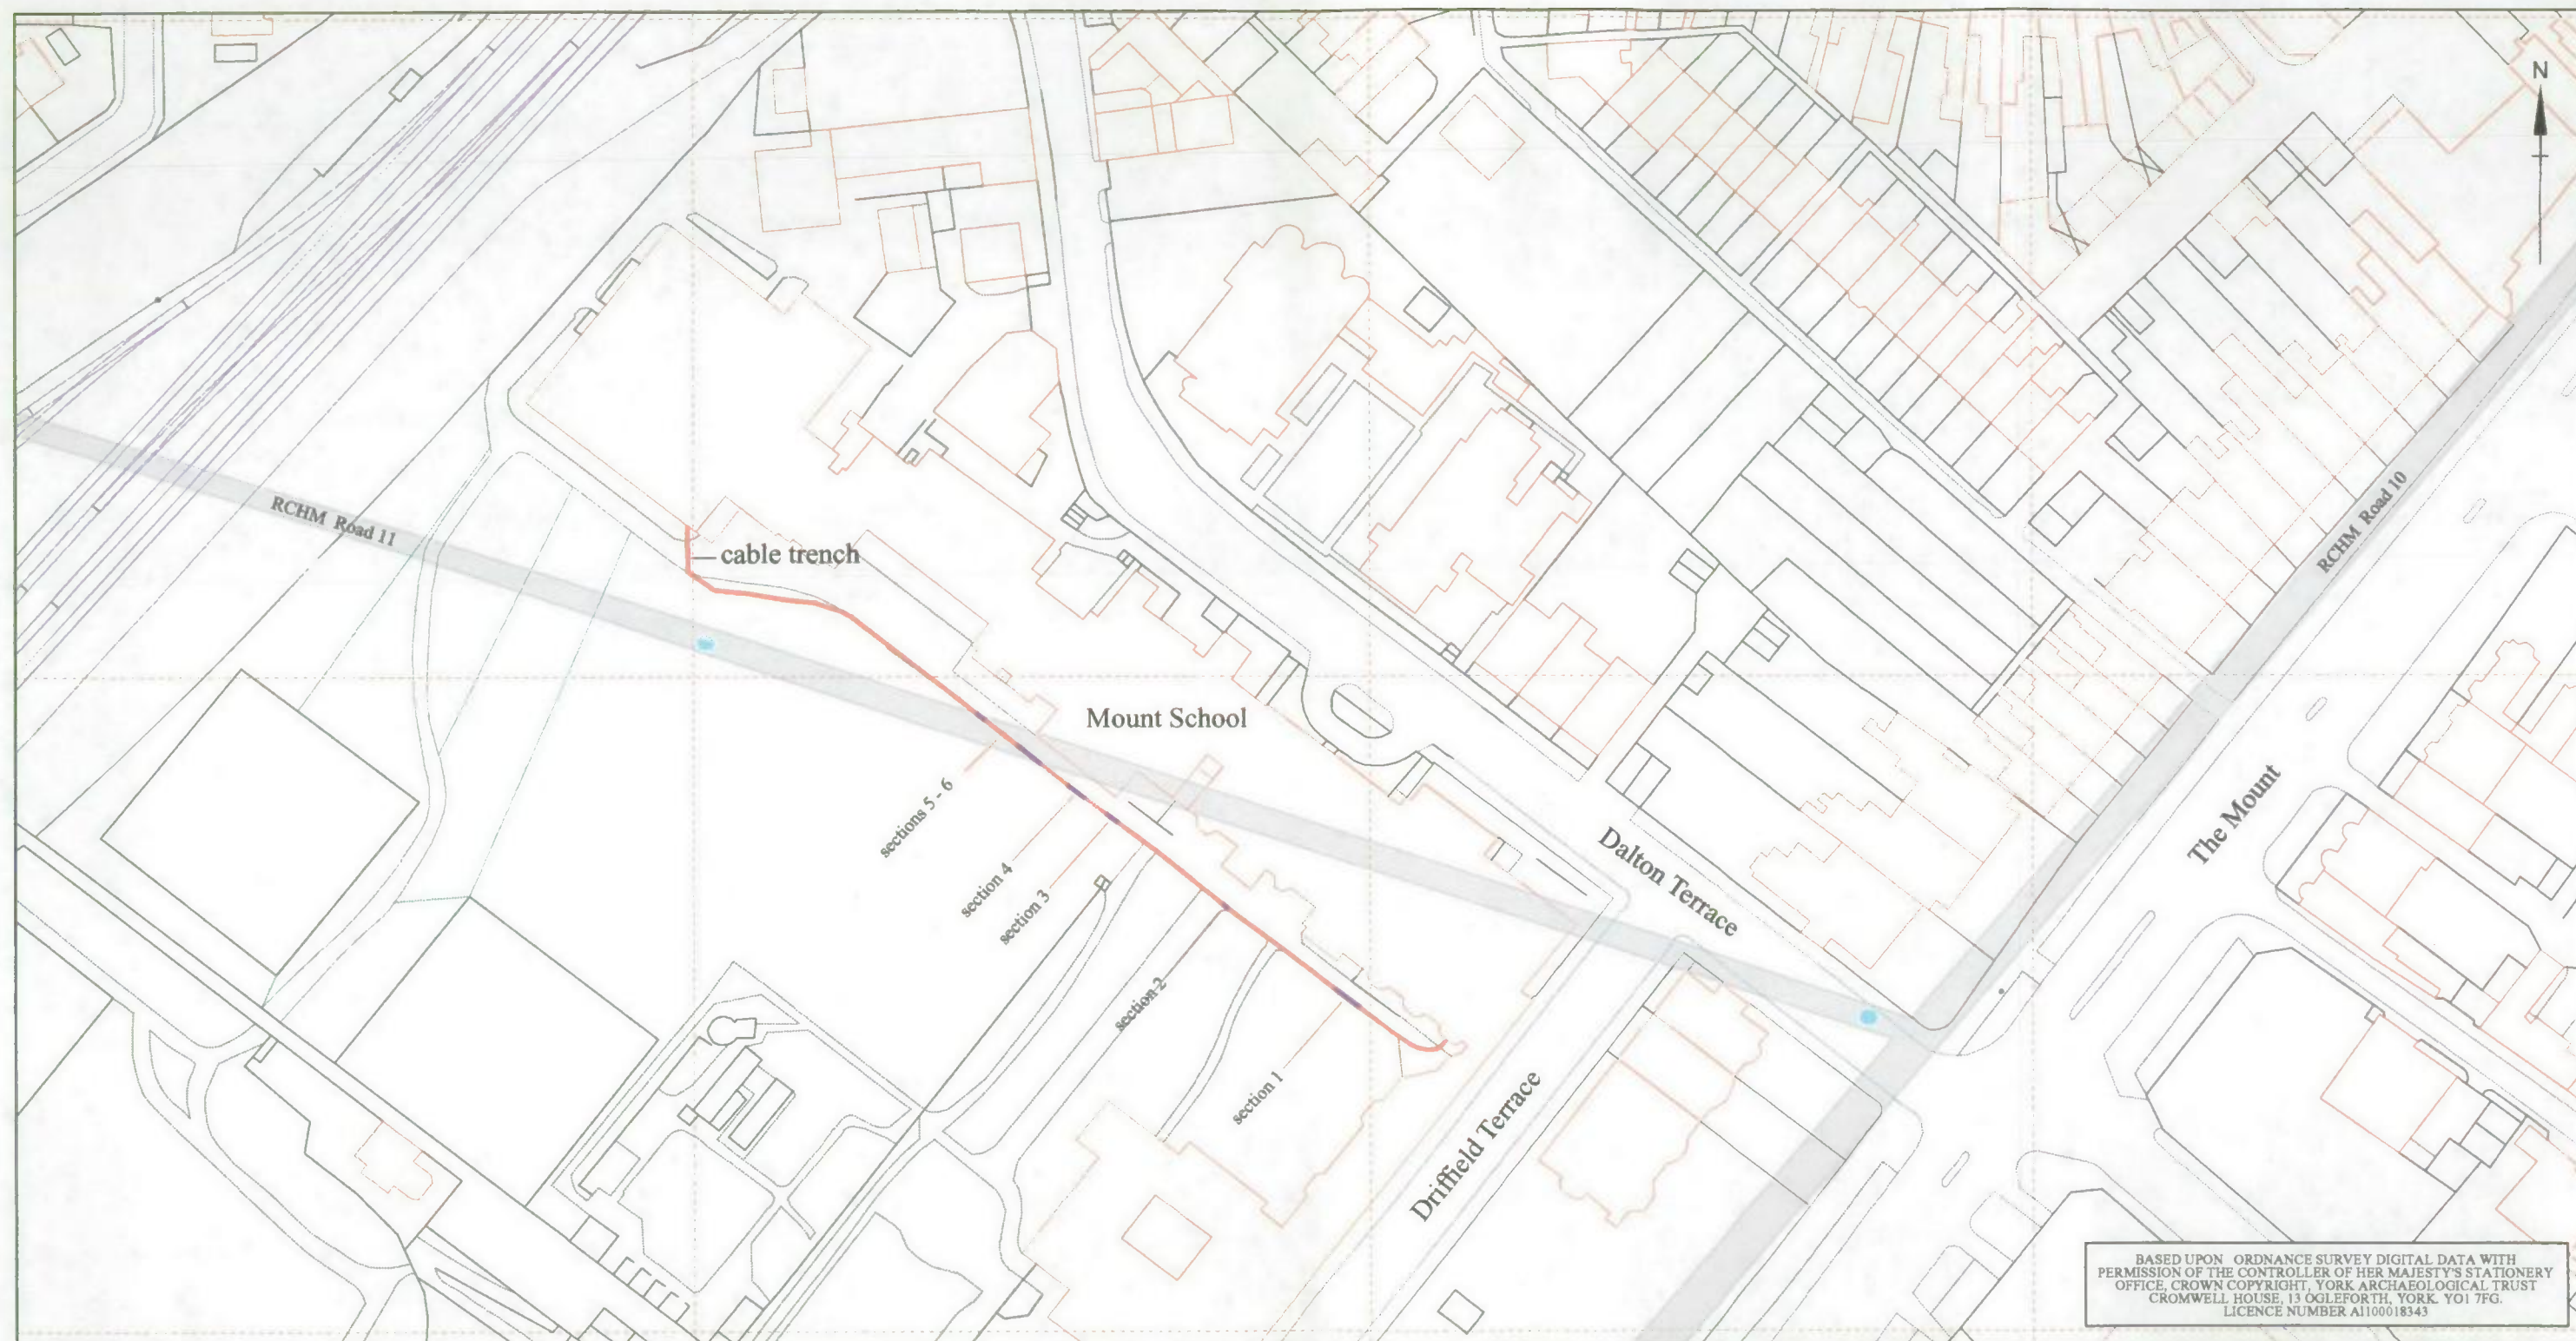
Works location plan, showing location of figure 3 sections, (RCHM Roads 10 and 11 also shown)
